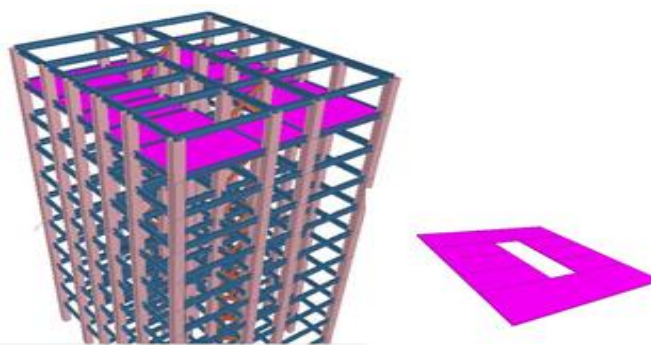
Steel Frame with Virtual Outrigger and Floor diaphragm (Model 4)
